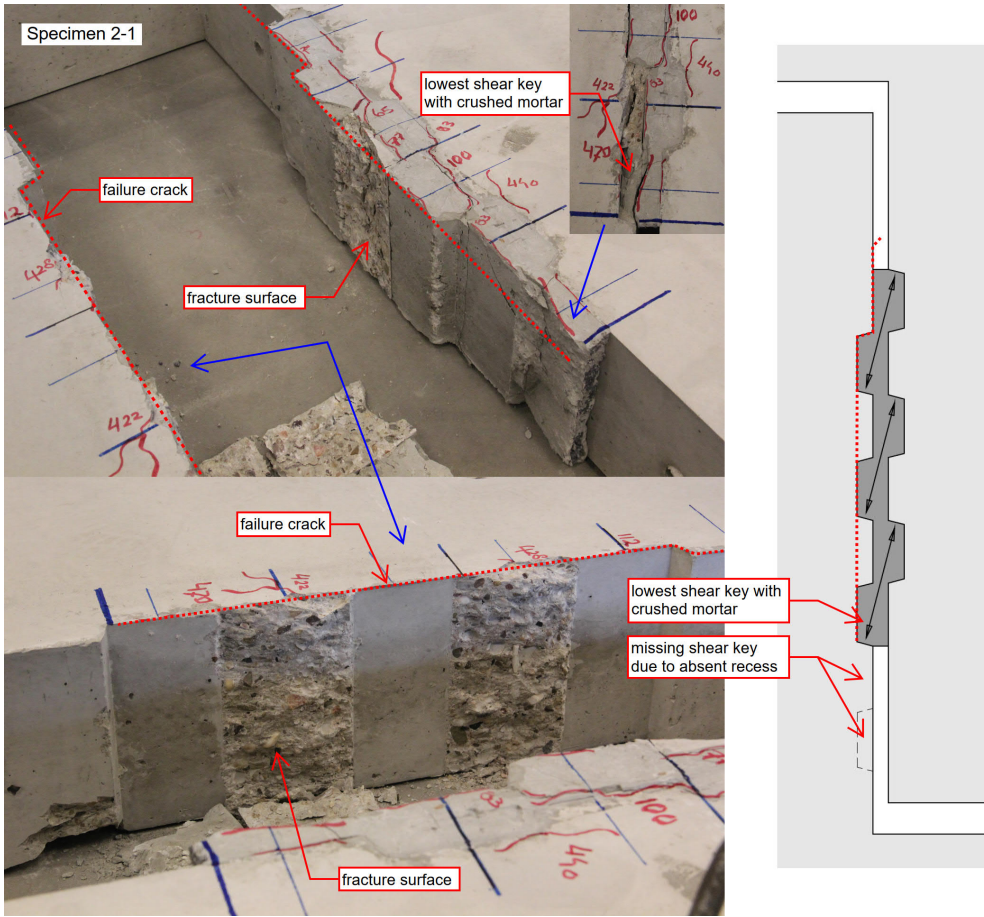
Fracture surfaces of Specimen 2-1 (viewed from the backside)
